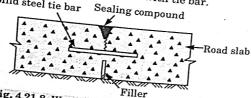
Warping joint types of tranverse joints. iv. Construction Joints: The transverse joint constructed when the construction work of the road slab is to be ended at a place other than a specified joint due to any reason is called a construction joints.
